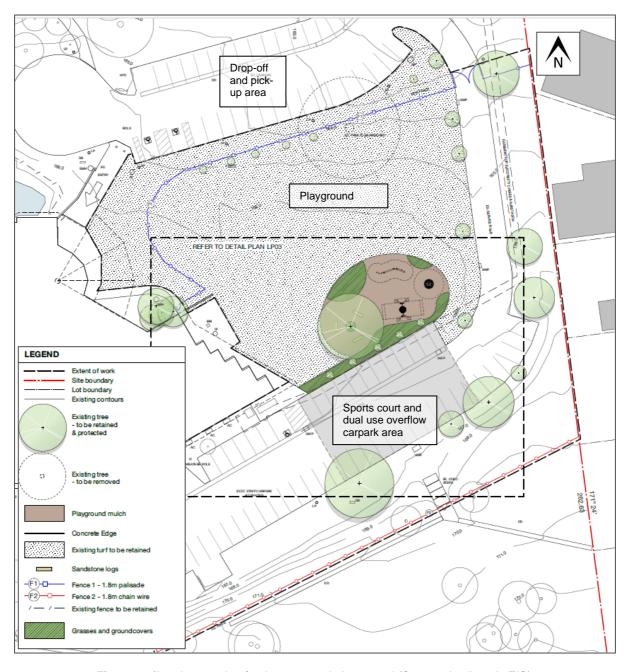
|Landscape plan for the proposed playground (Source: Applicant's EIS)
